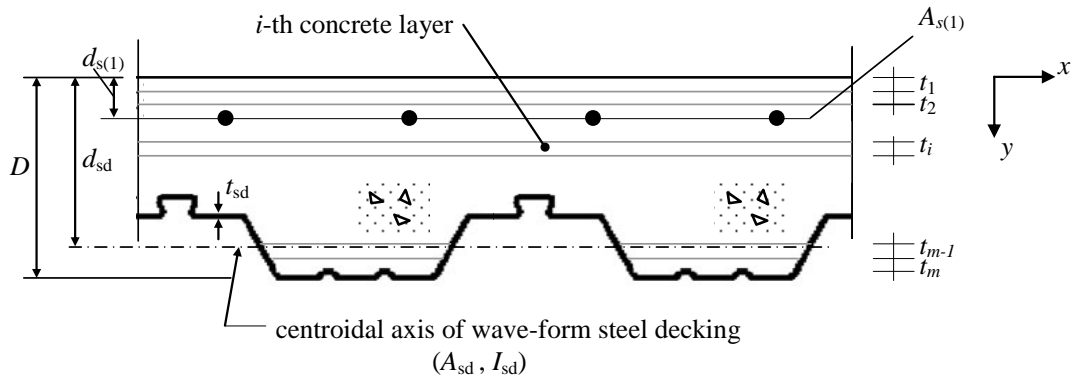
Typical slab cross-section with concrete subdivided into m layers.
